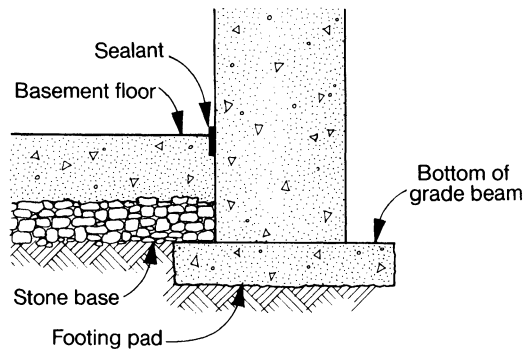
Earth pressure transfer from basement wall to slab on ground using grade beam construction.
